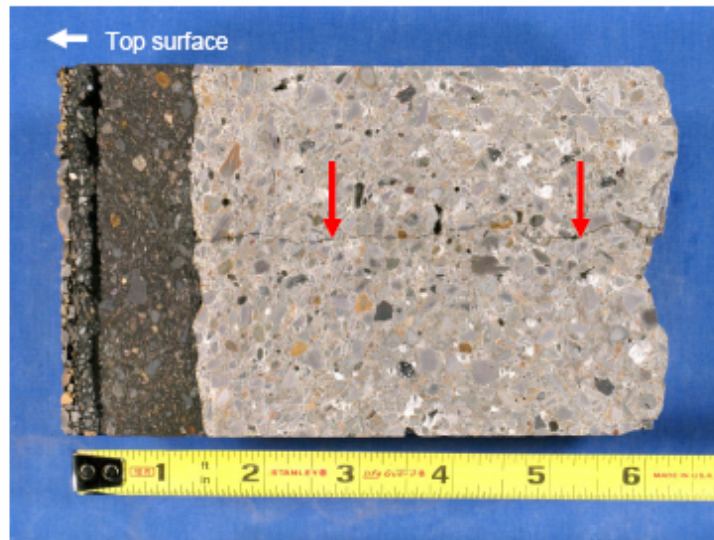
Cut and lapped cross-section of Core C1S2 showing general appearance of the topping and the concrete. Arrows indicate a vertical crack in the concrete. Top surface is to the left. Scale is marked in inches.
